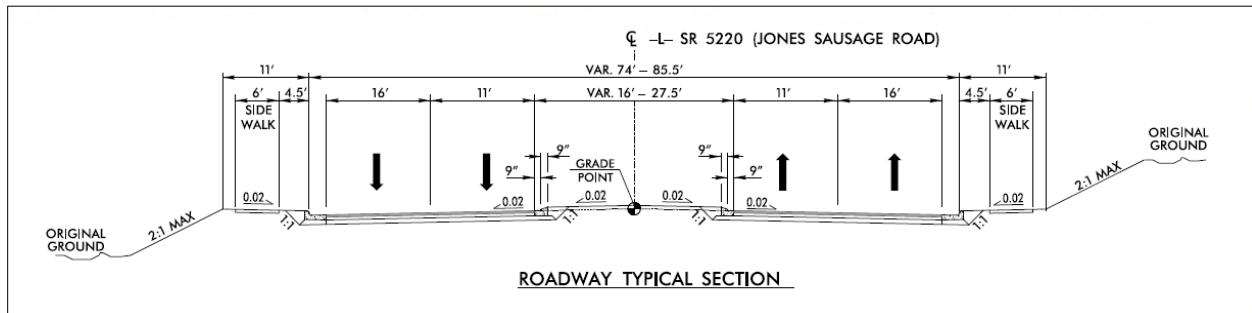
Jones Sausage Road Feasibility Study Roadway Typical Section
